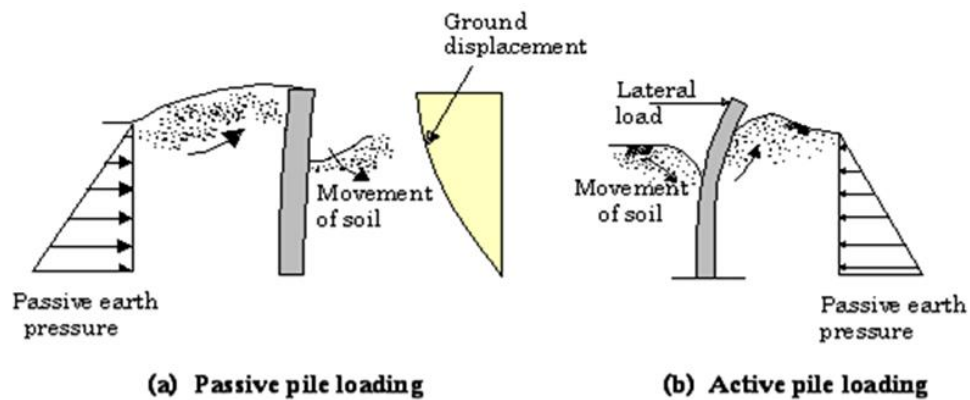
22): Laterally loaded pile; (a) Passive pile loading; (b) Active pile loading
